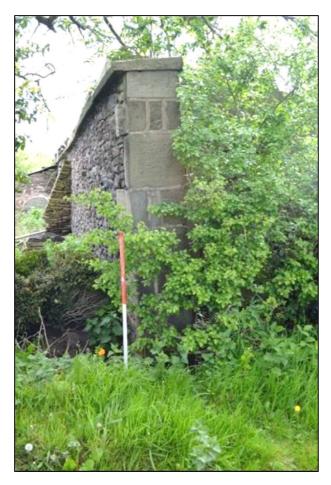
(Shot 120): West end of Wall 7, looking east (1m scale)
